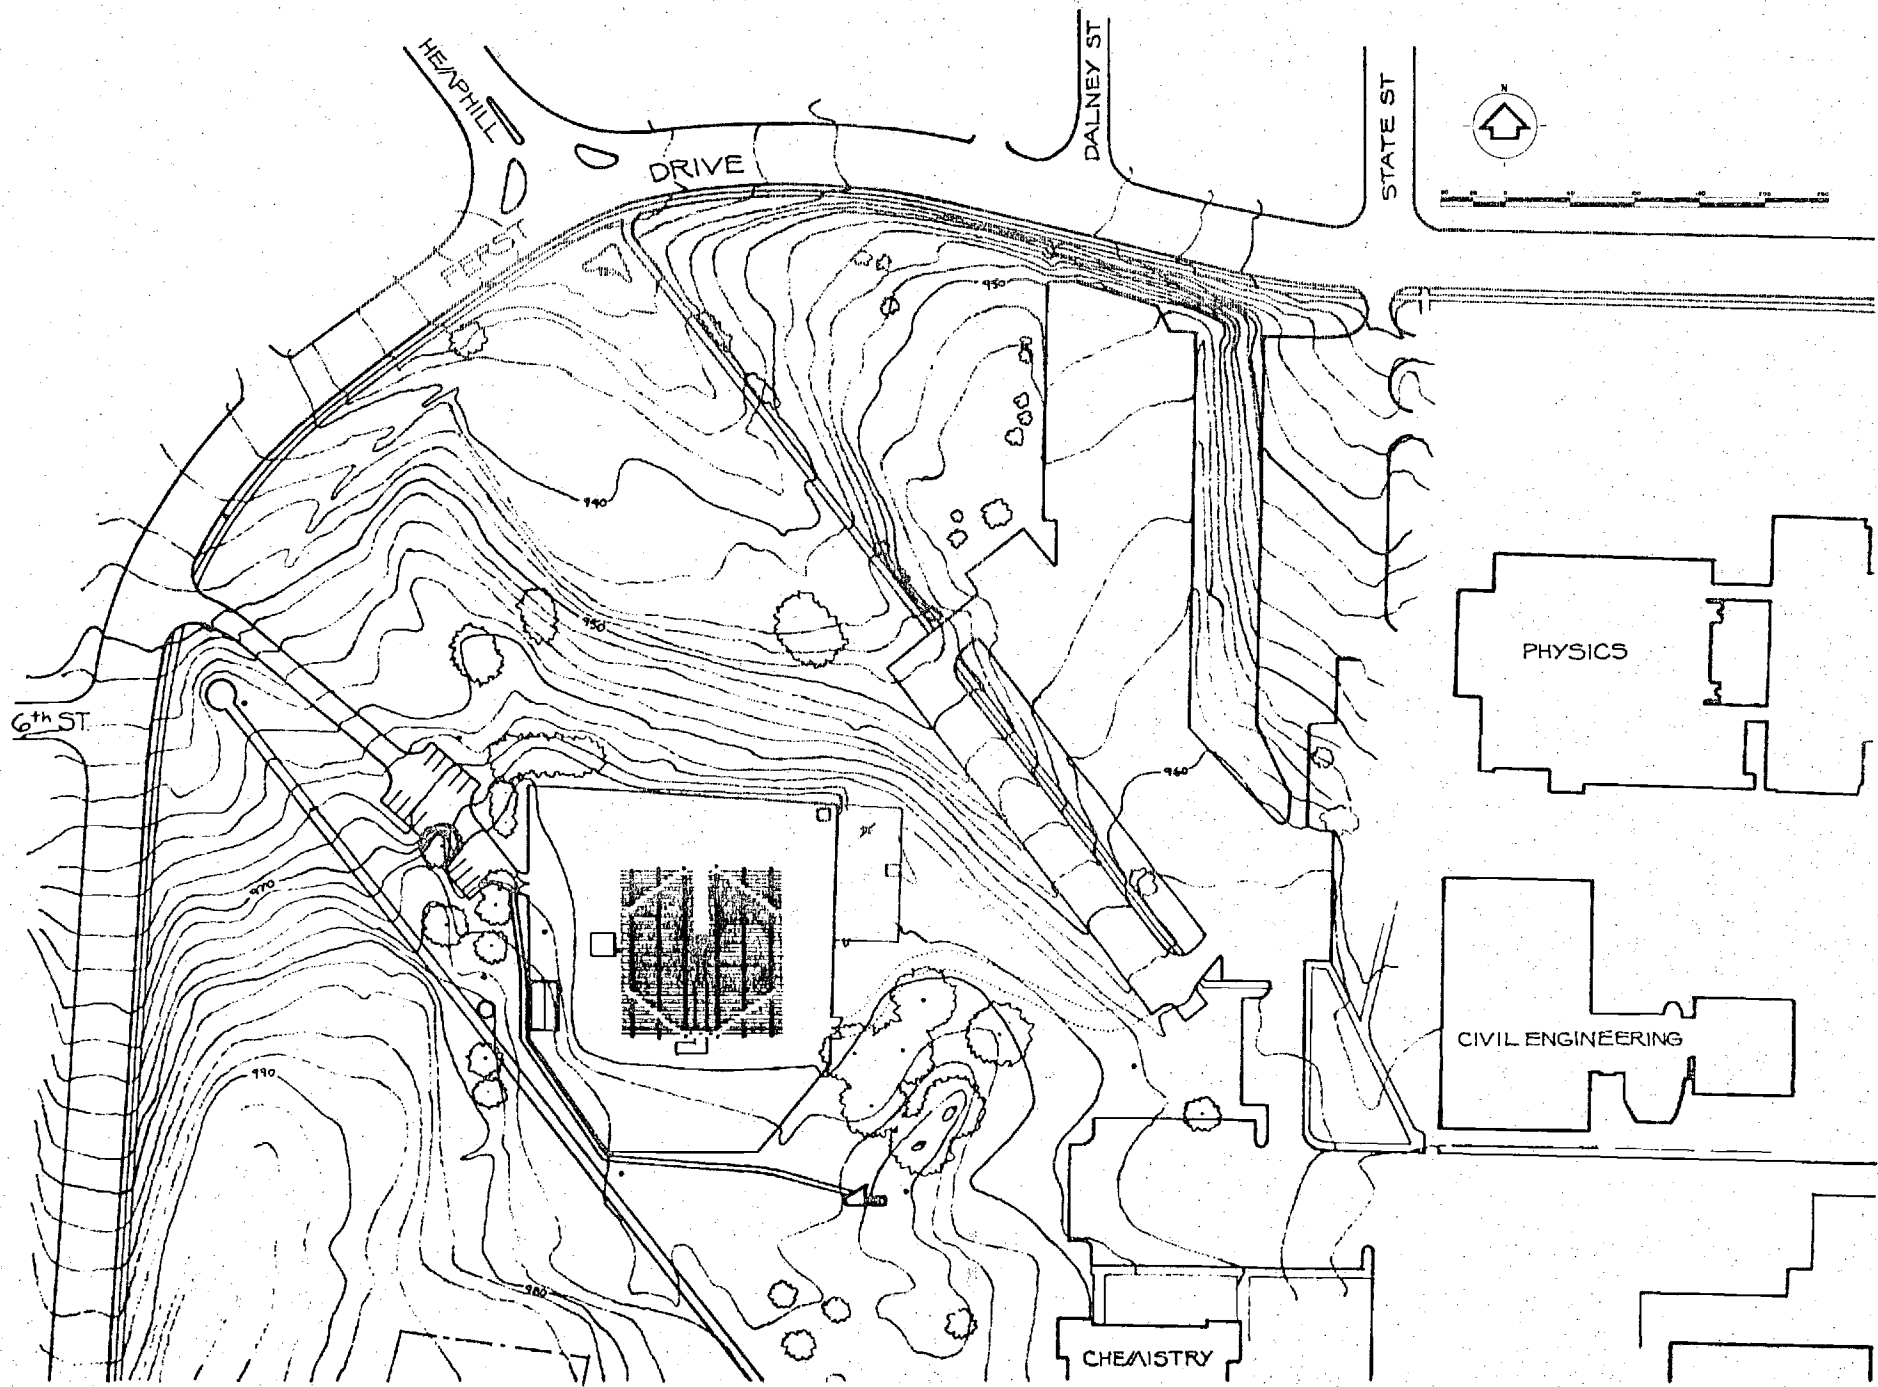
Campus Layout of Georgia Tech Solar Thermal Test Facility,
